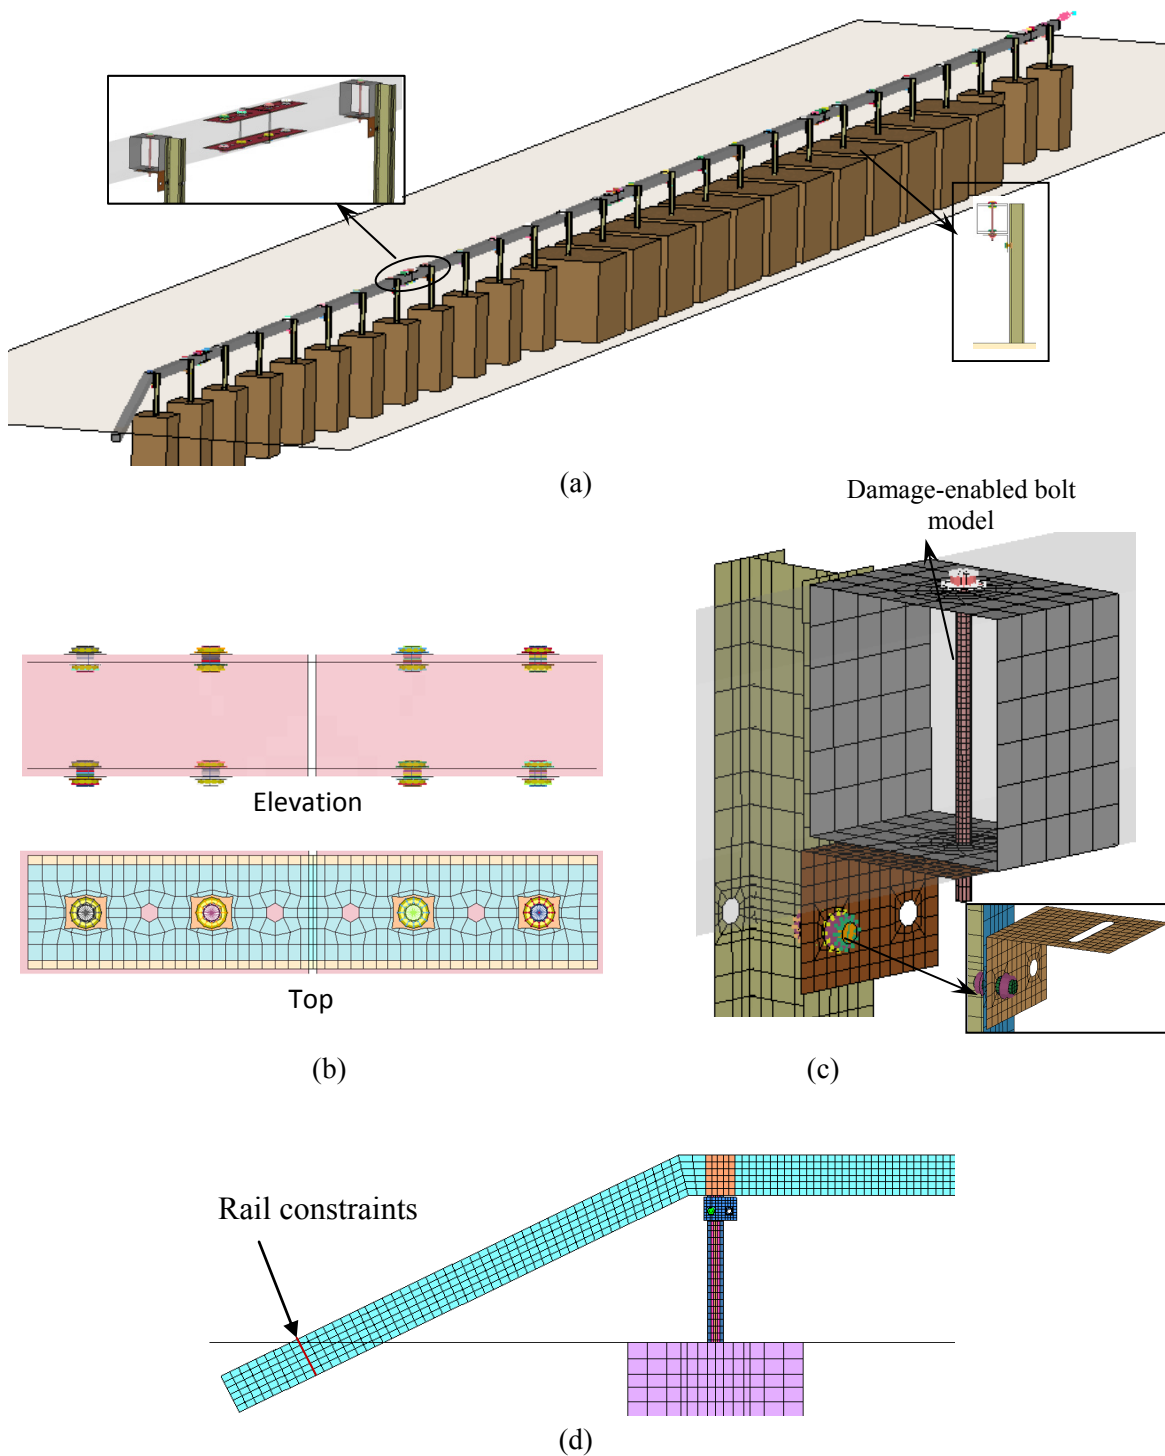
(a) Finite element model developed for the box-beam guardrail system. (b) Model for connection between rail, supporting bracket, and post (c) splice plate connection (d) Turned-down end-terminal.
